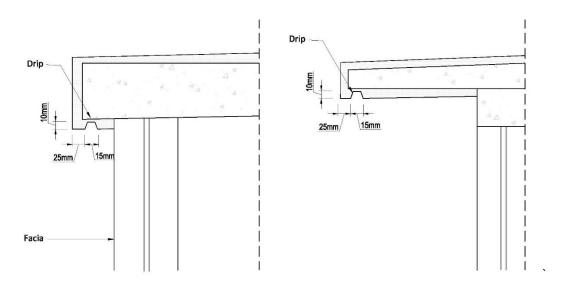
Typical drip edge detail on projected façade elements. Image on the left illustrates detail on recessed window and image on right illustrates detail on sunshades.
